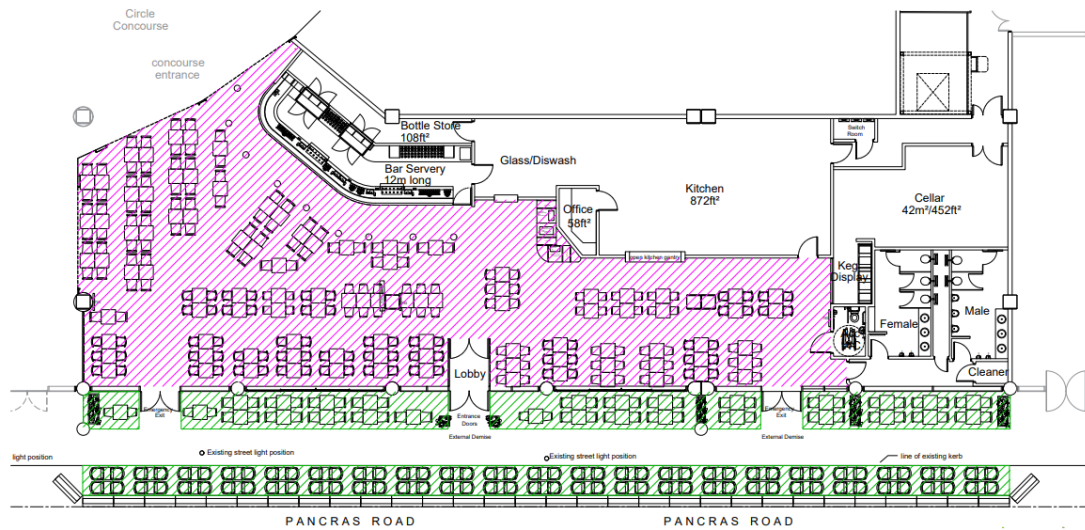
Plan showing the existing permanent seating adjacent to the elevation and temporary seating in the loading/drop off bay.
